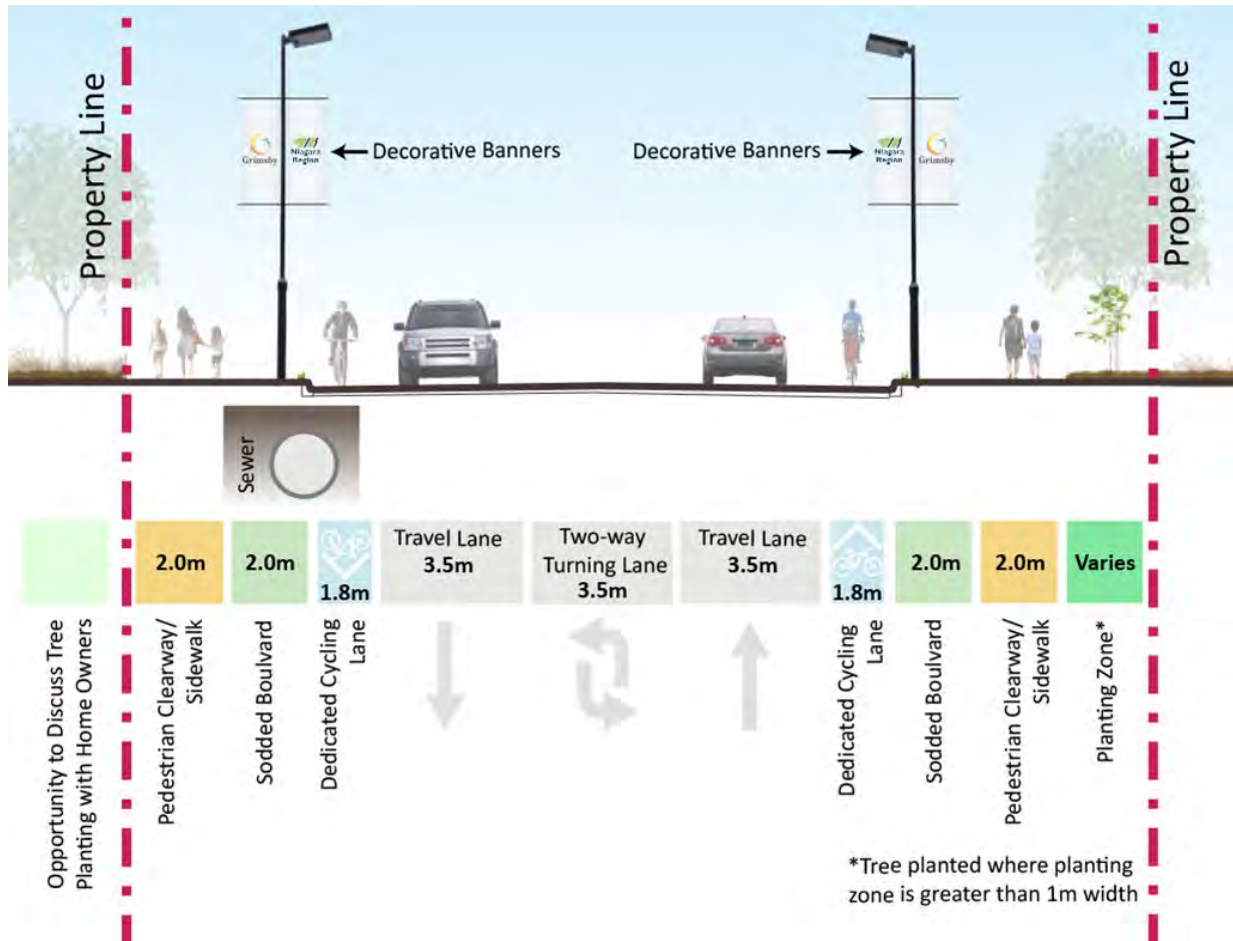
Typical Proposed Casablanca Boulevard Cross Section (south of Livingston Avenue)
